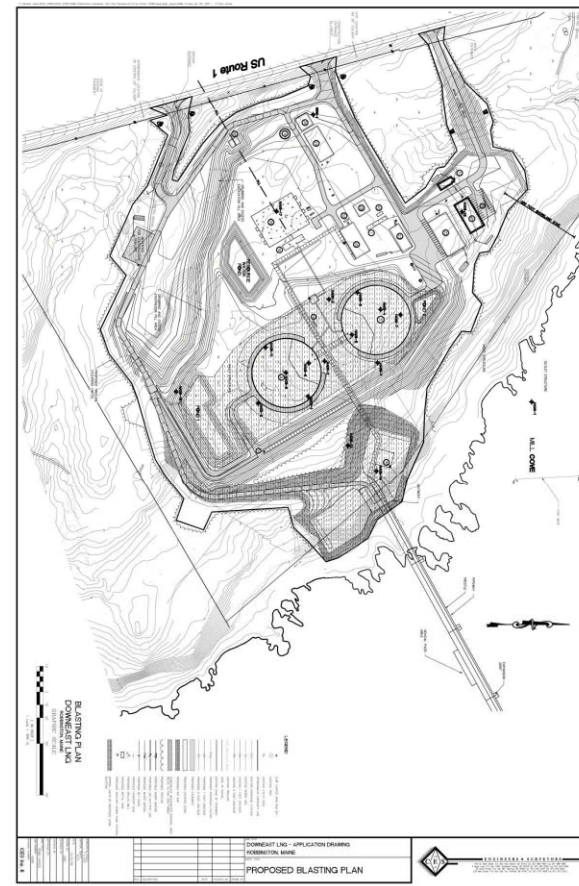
DELNG proposed site layout, elevations and access to Rte. 1.
